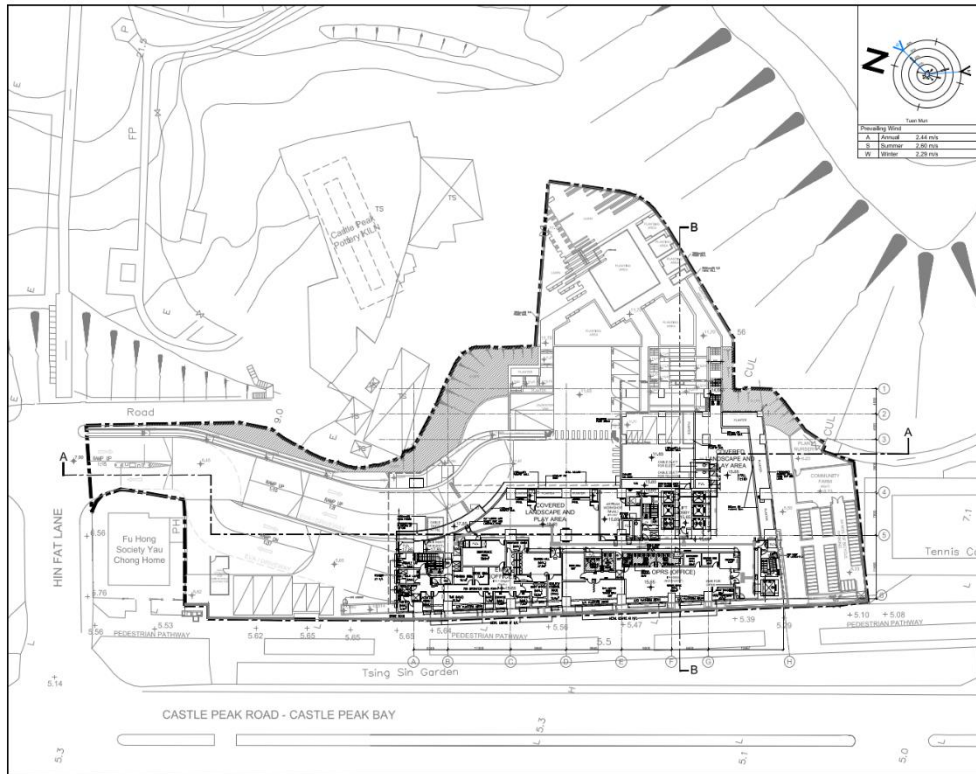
Indicative Plan of Proposed Scheme (First Floor)
